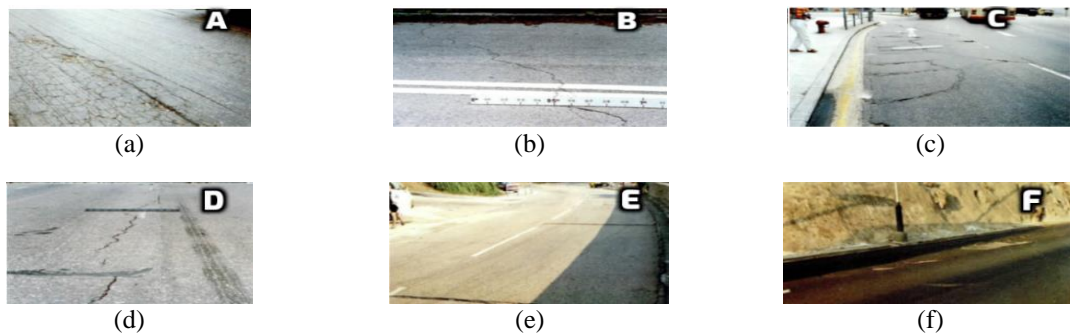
Types of bituminous pavement cracks [11]: (a) crocodile cracks, (b) diagonal cracks, (c) block cracks, (d) longitudinal cracks, (e) transverse cracks, and (f) slippage cracks
